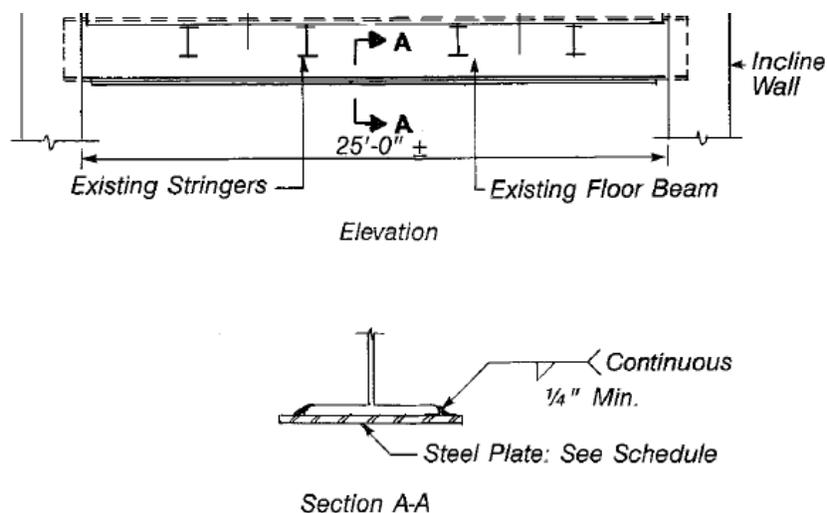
Typical Framing Steel Repair at Temporary Incline
